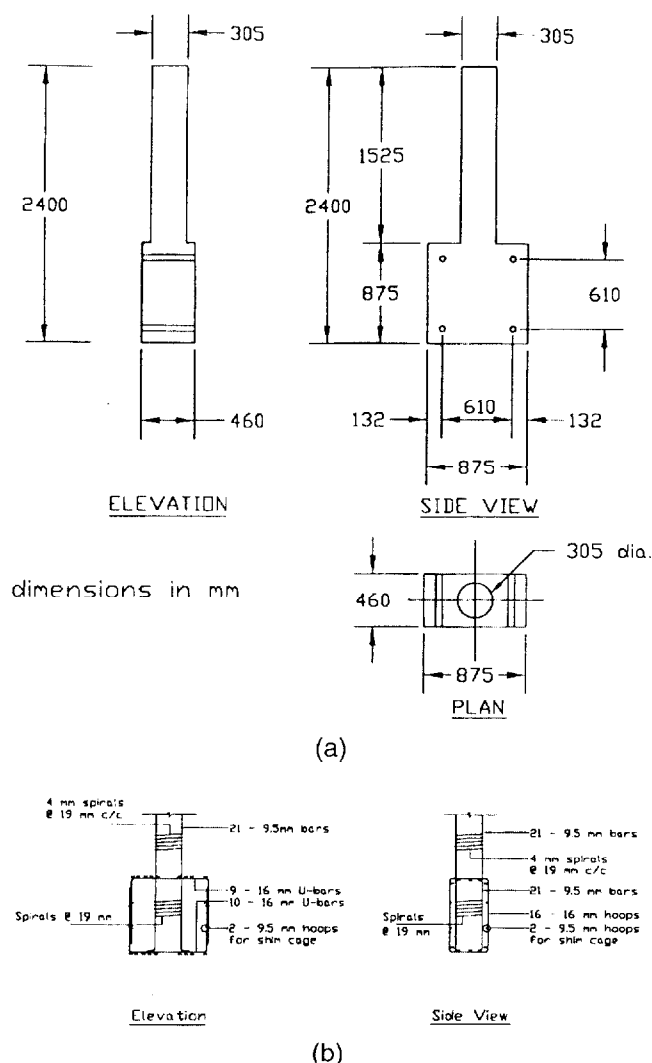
Specimen details: (a) configuration and dimensions; and (b) reinforcement.
